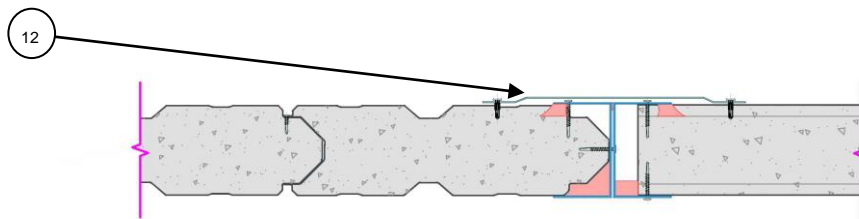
C- straight panel connection details Vertical to Horizontal panels with steel flashing
